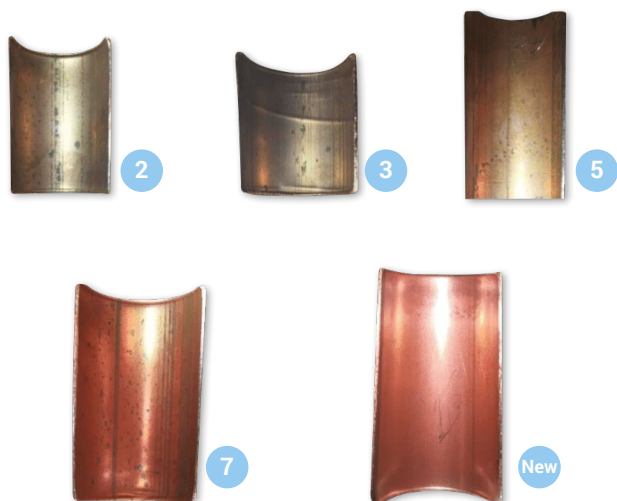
Photographs of sections of pipes' inner wall surface for detailed observation.
